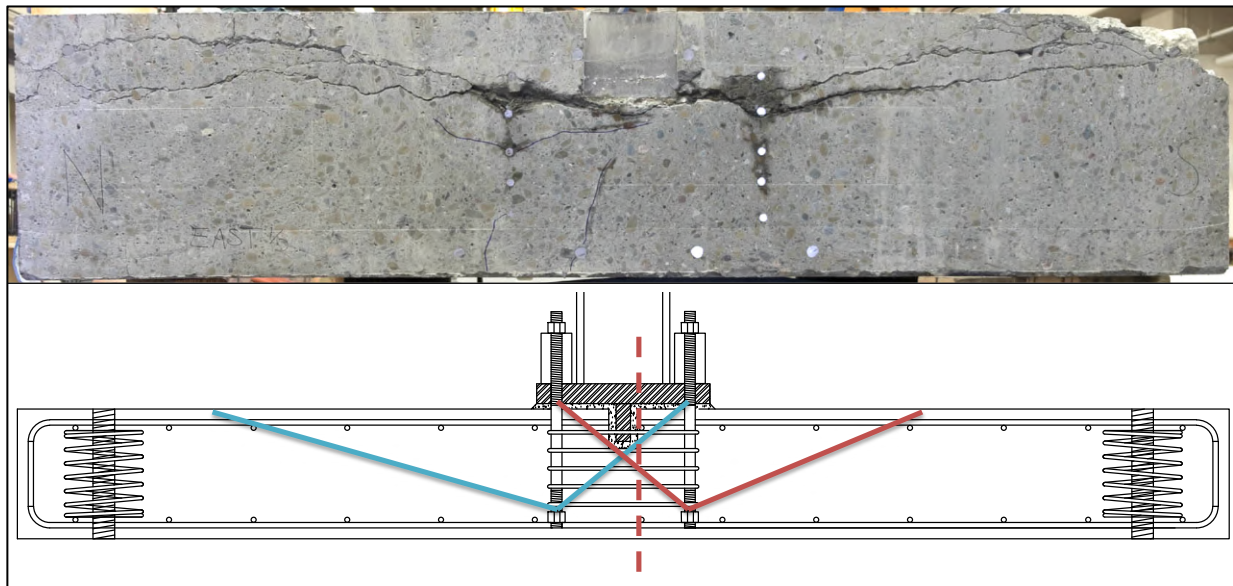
Slab cross section of east section showing two horizontal cracks corresponding to the two breakout cones indicated in the bottom drawing
